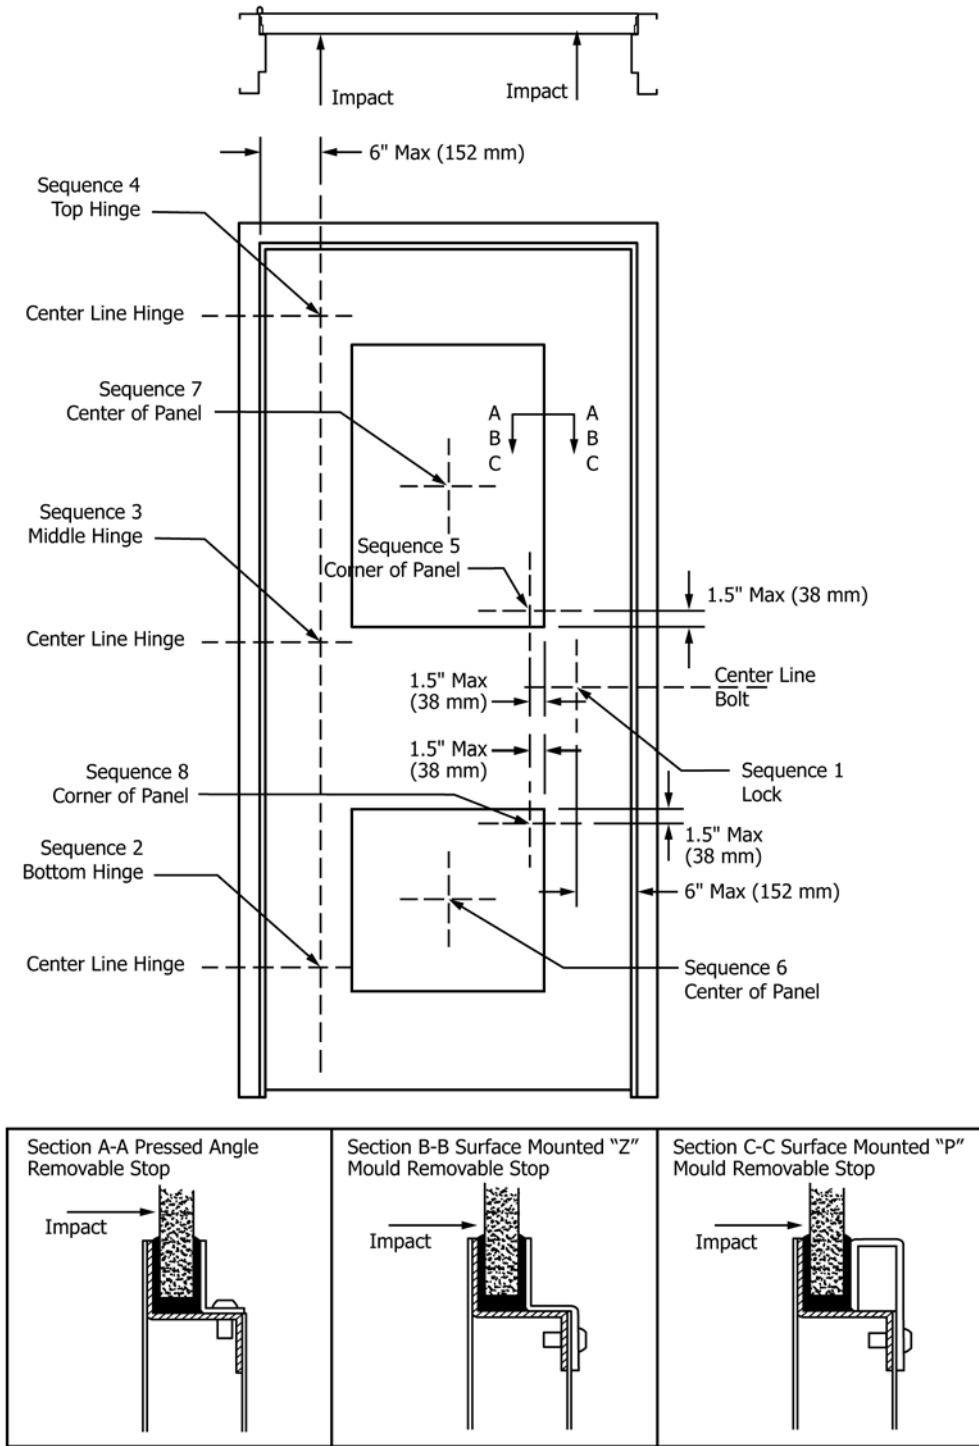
Test Assembly Door Elevation #2 Location of Strike Points Described in Table 2
